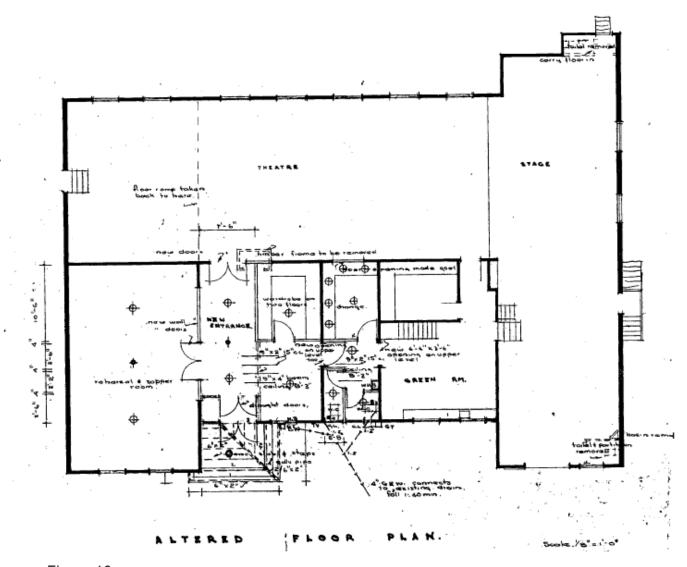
Floor plan of Theatre showing layout of the 1957 alternations.
